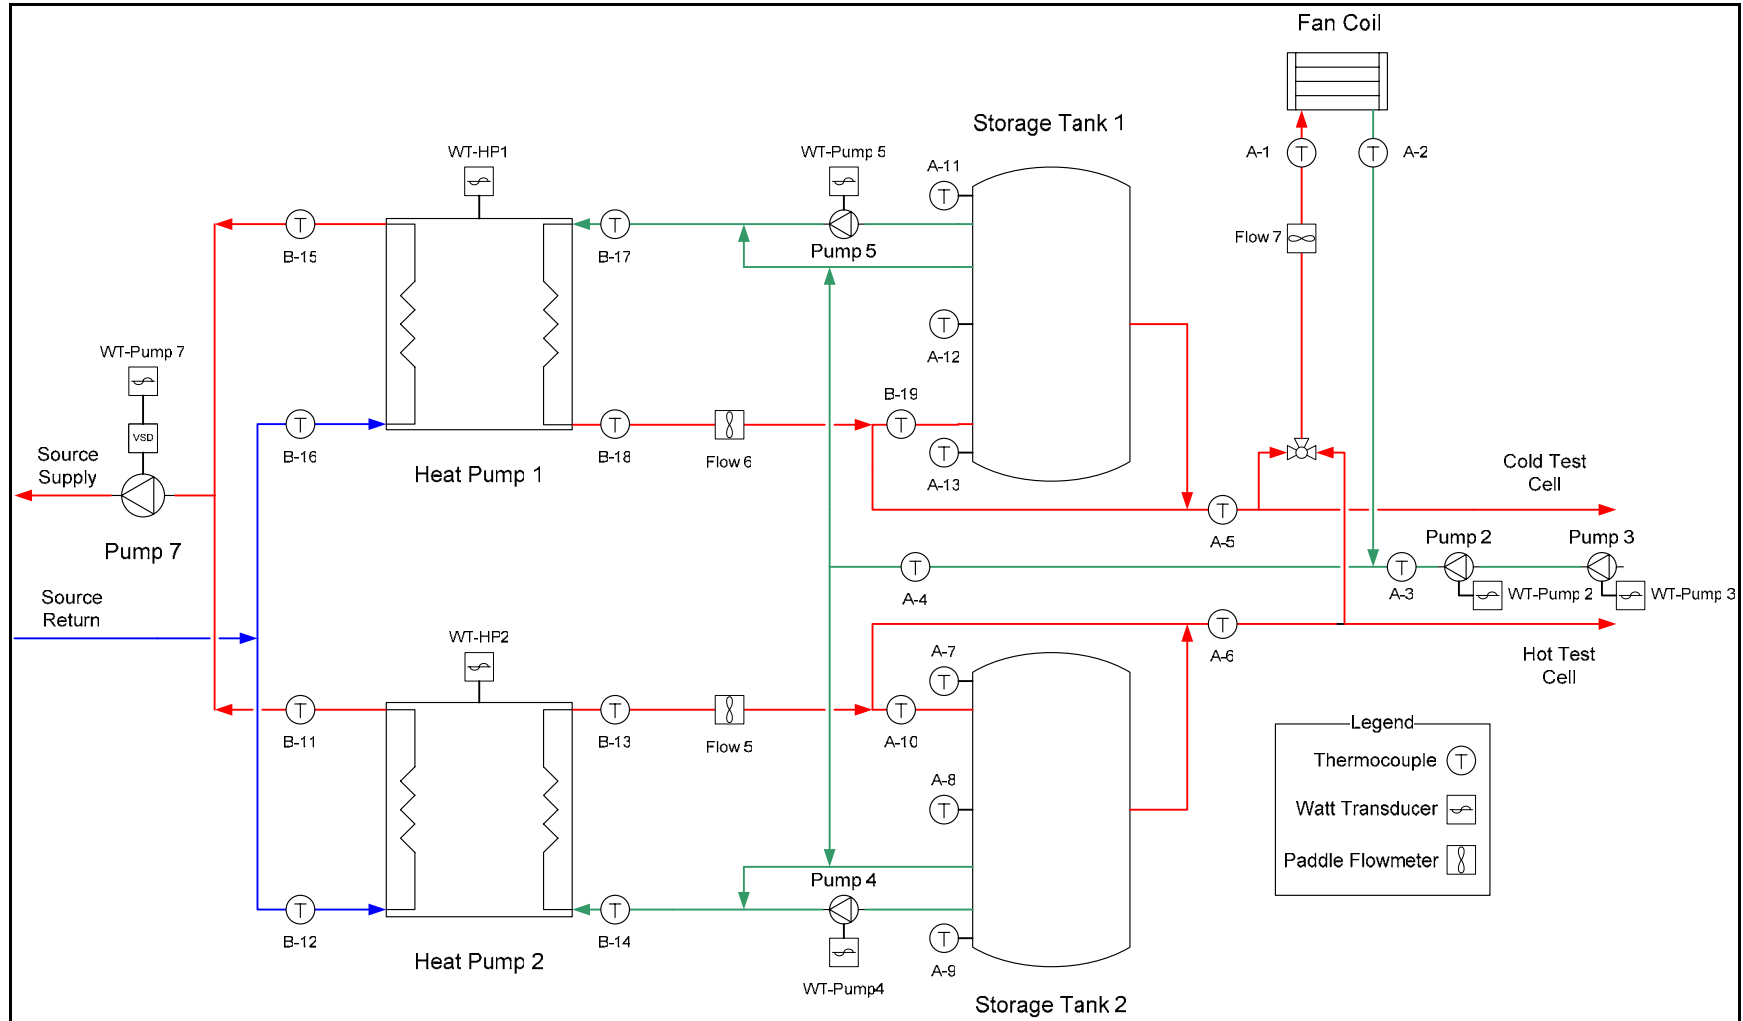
Load and Primary Equipment Instrumentation Schematic
